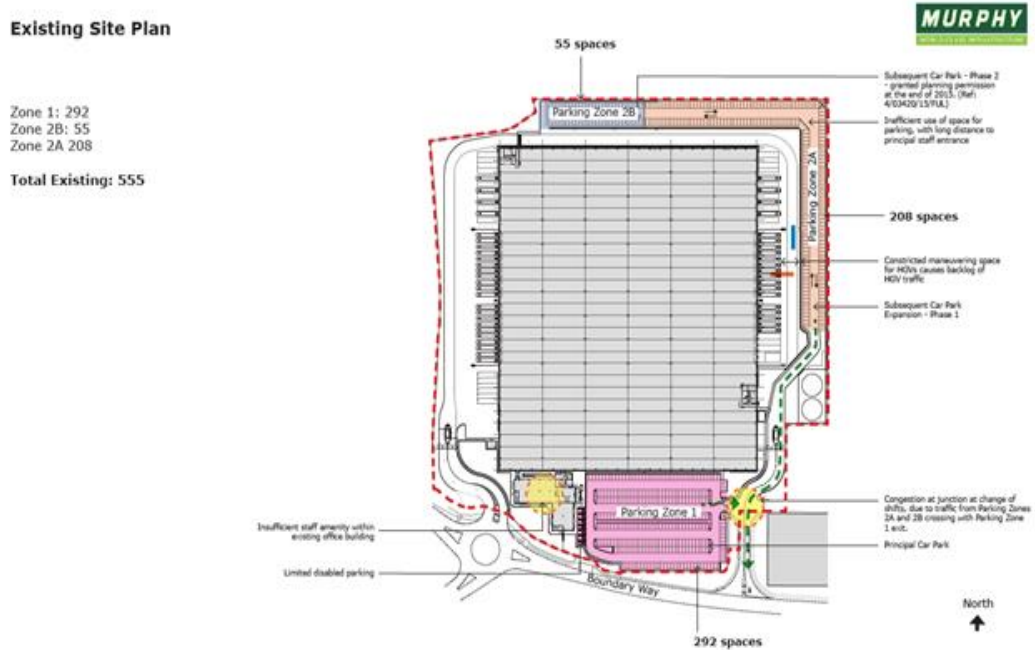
Existing Site and Parking Plan (prepared by GTH)
